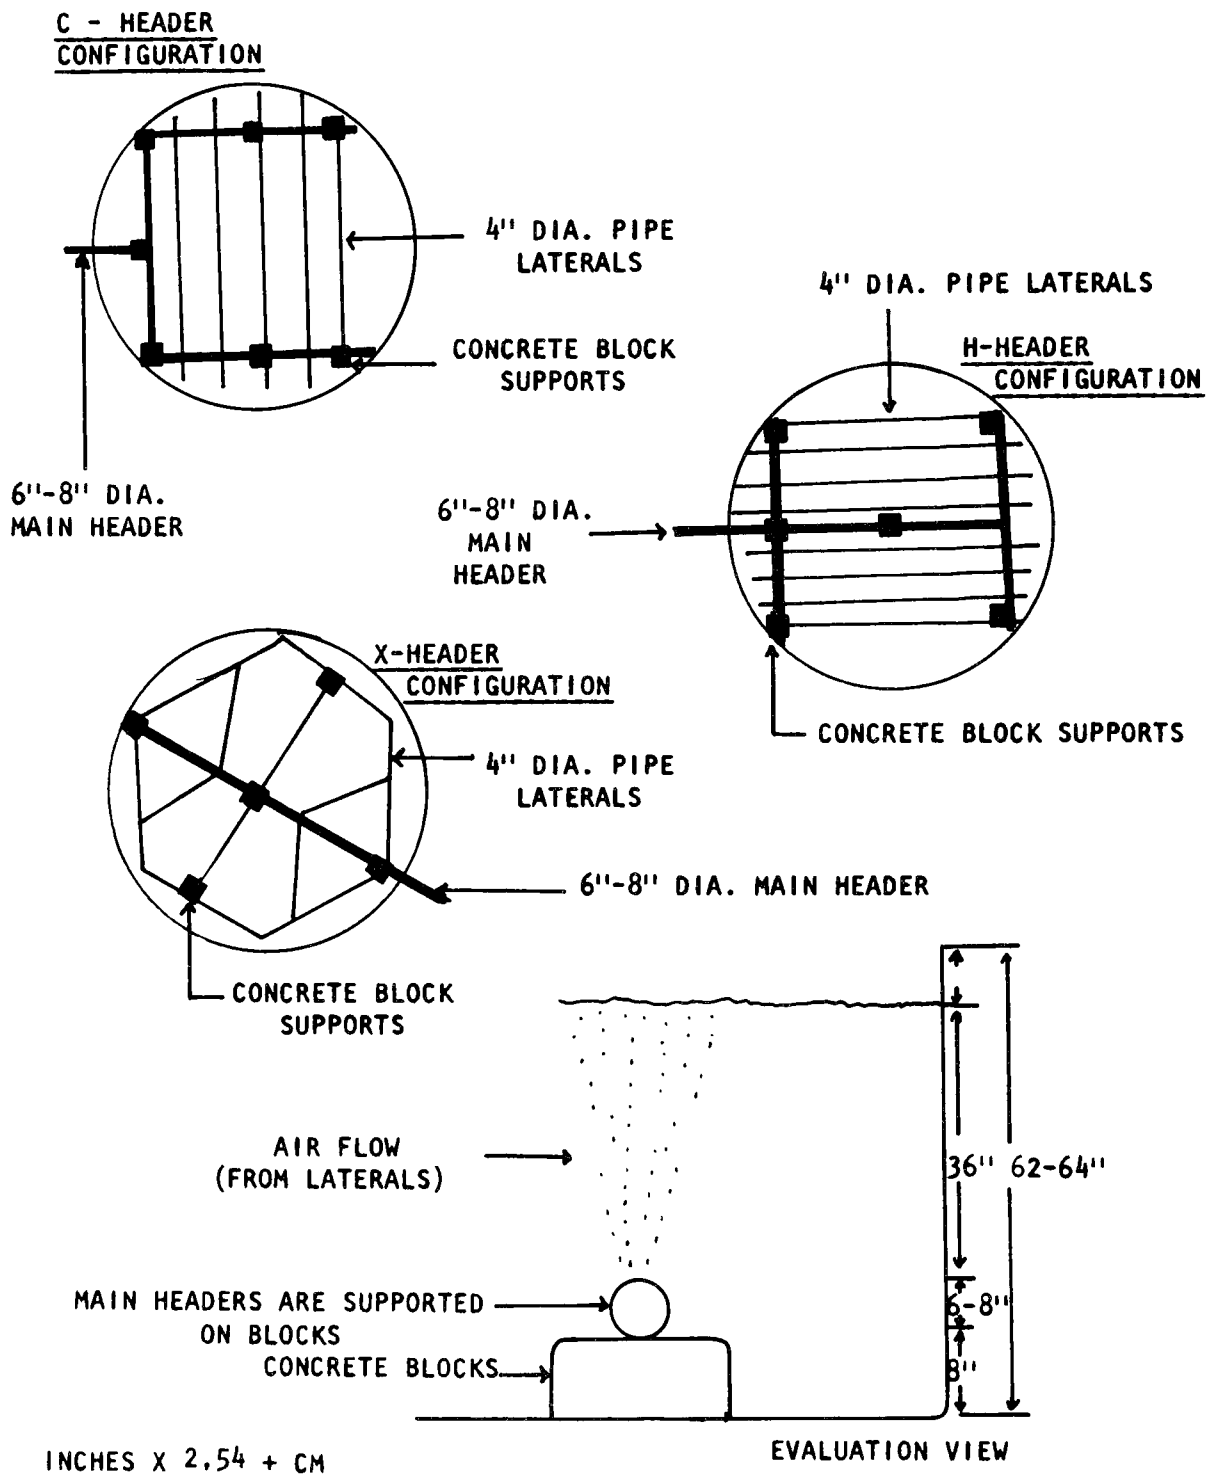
Aeration tank header alternative plan view layouts and schematic of header support
